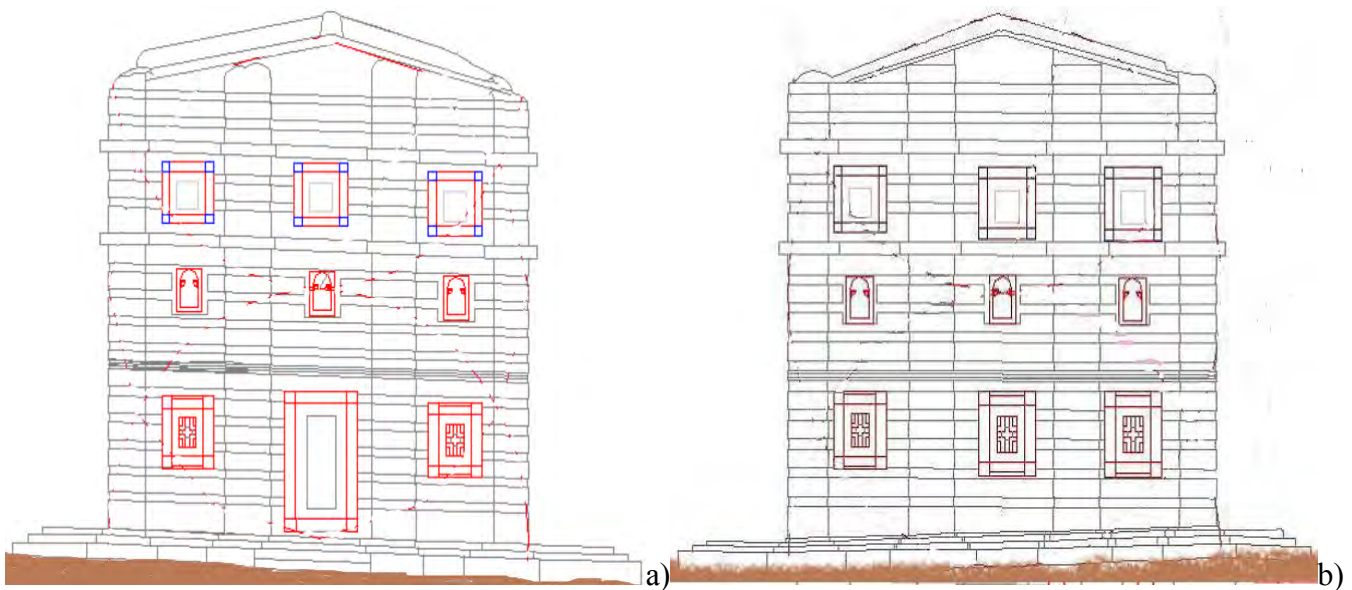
a) The Front (East-West) Elevation Plan of *Bete Amanrael* b) The Rare Side Elevation Plan of *Bete Amanrael
